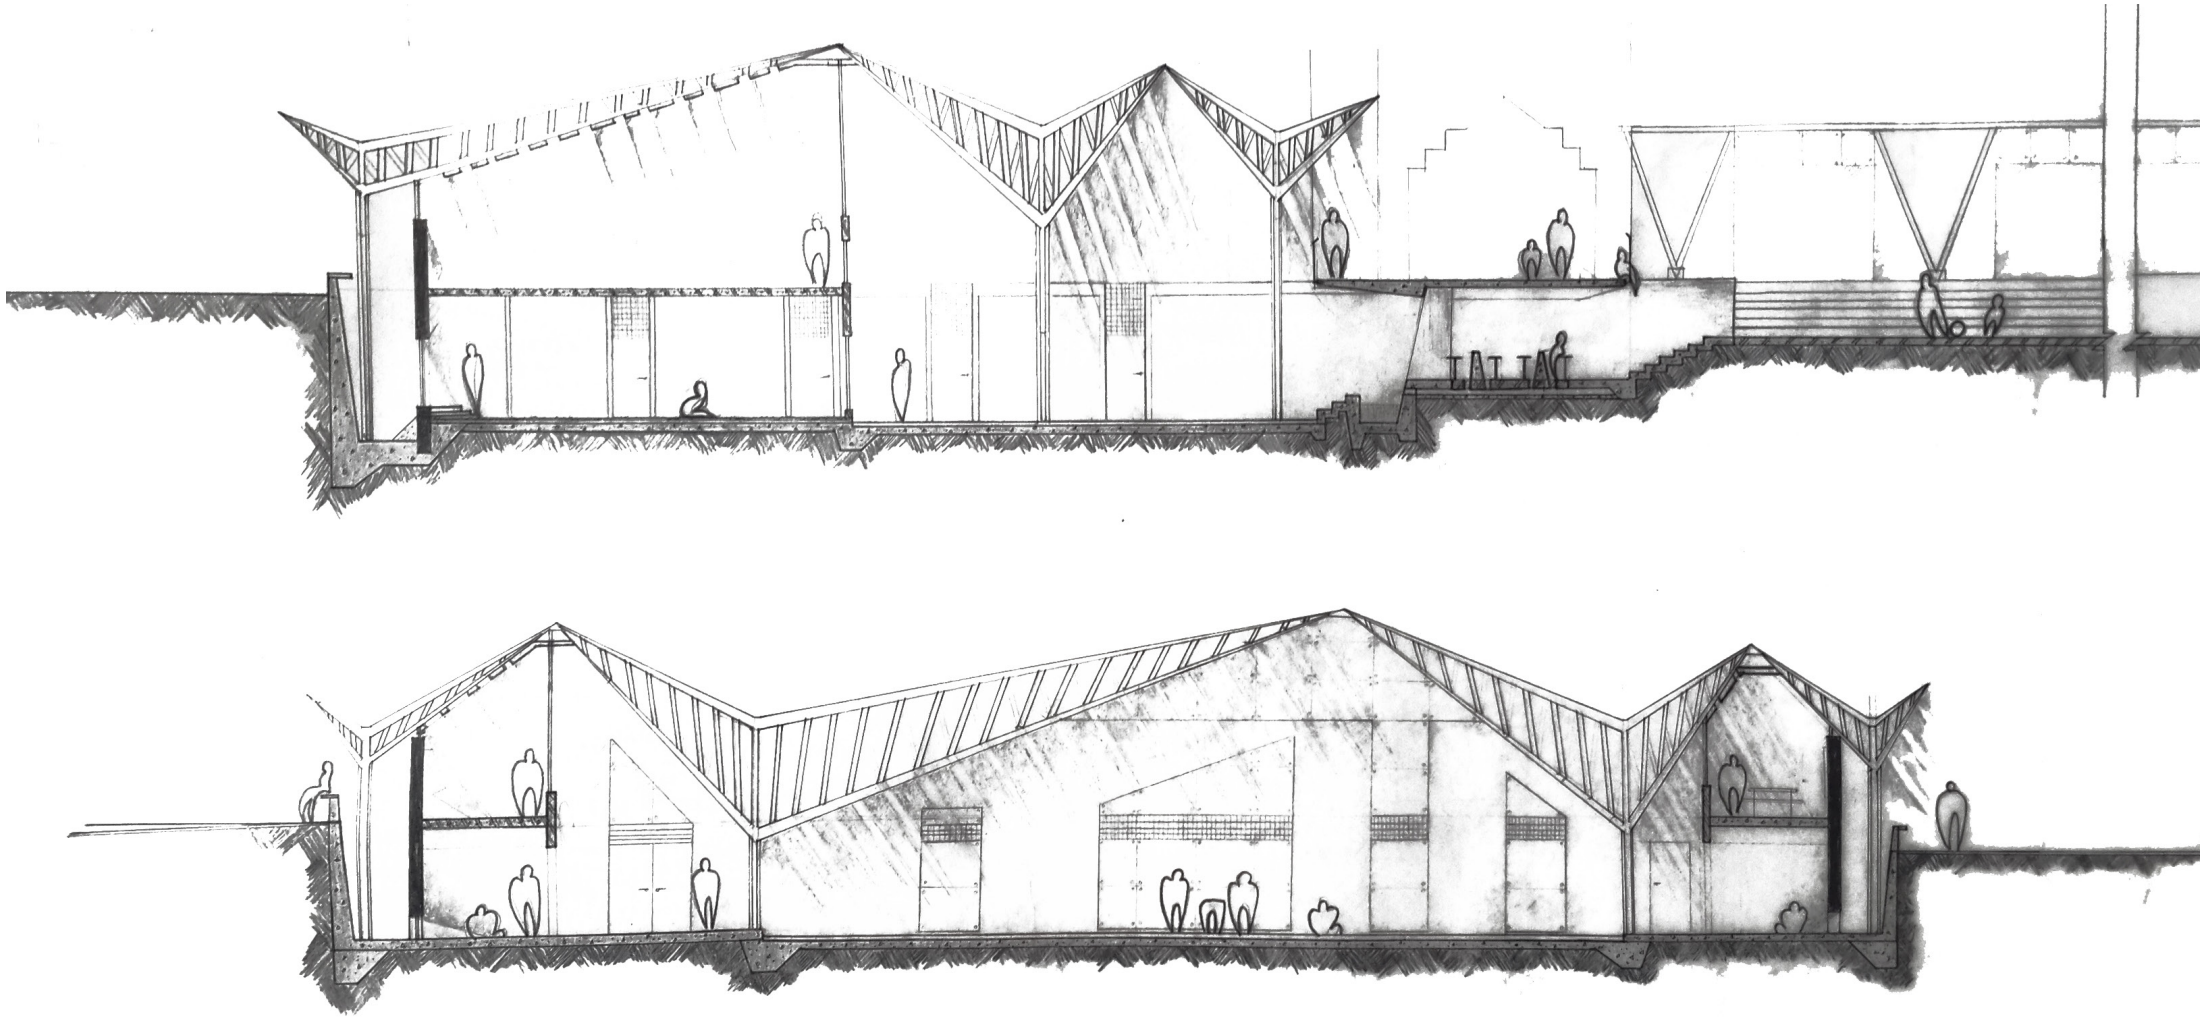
SECTION OF INTERNAL SPATIALITY BENEATH TECTONIC ROOFING STRUCTURE
